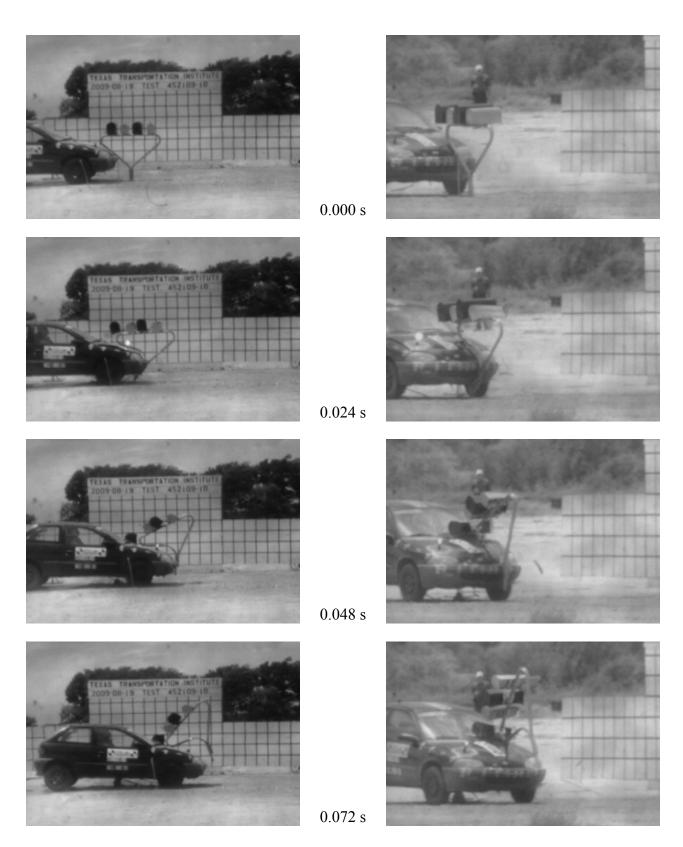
Sequential Photographs for Test No. 452109-10 (Perpendicular and Frontal Oblique Views).
